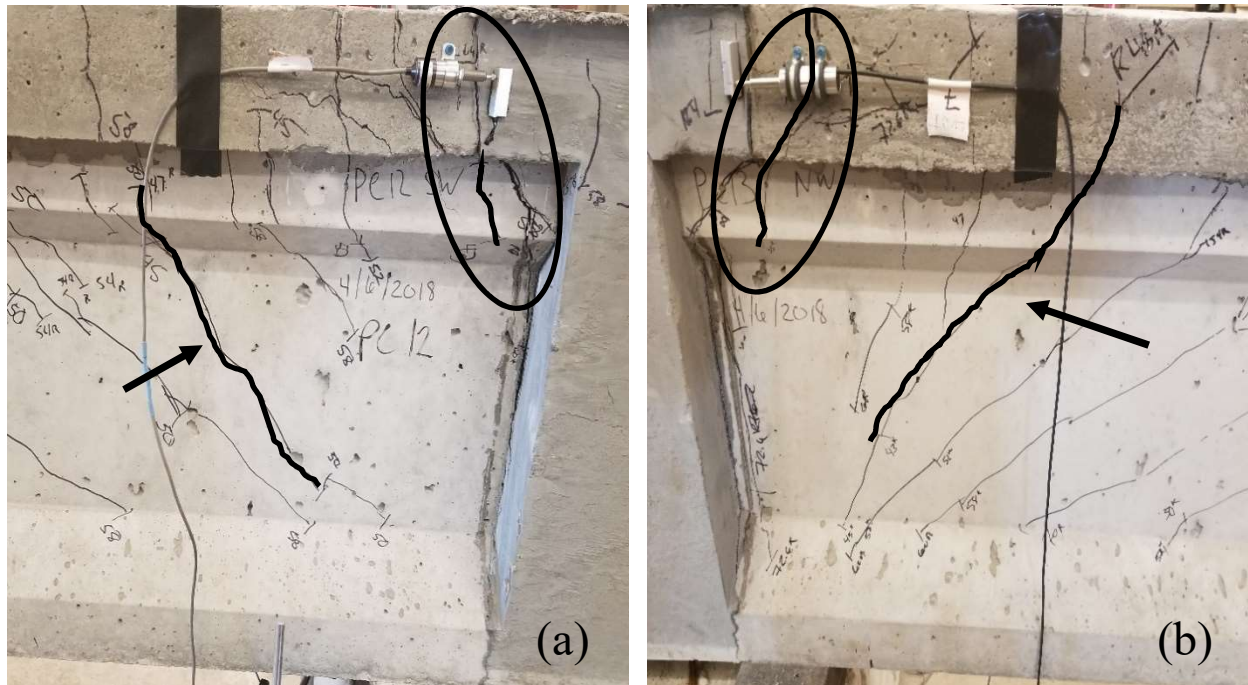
Initial flexural cracking on the NC1-N girder at 43 kips of load and initial flexure-shear cracking on the NC1-N girder at 45 kips of load (a) and initial flexural cracking on the NC1-S girder at 35 kips of load and initial flexure-shear cracking on the NC1-S girder at 43 kips of load (b). Dark ovals indicate the initial flexural cracking near the continuity joint, and arrows point to the dark lines that indicate the initial flexure-shear cracking.
